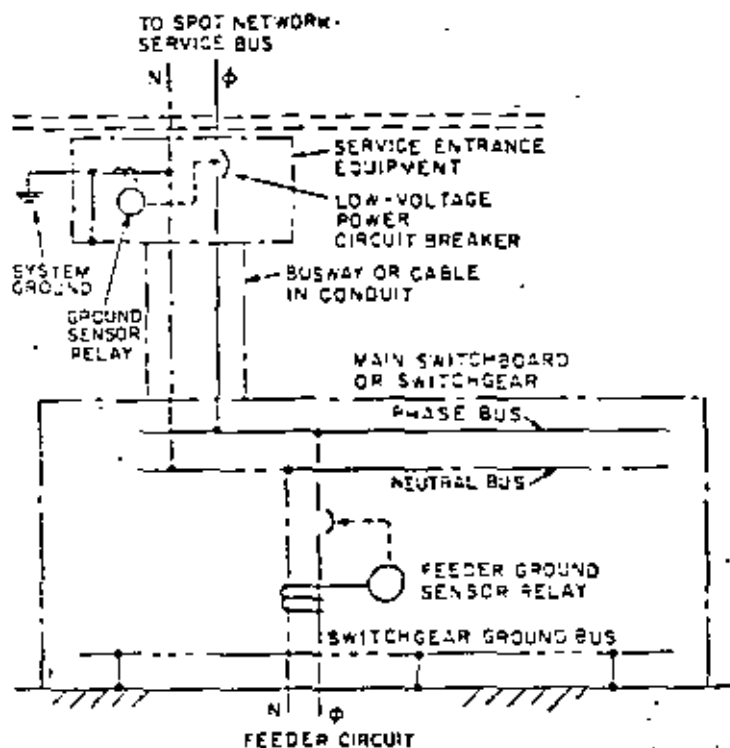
Protection of service entrance equipment and main switchboard for commercial building.
